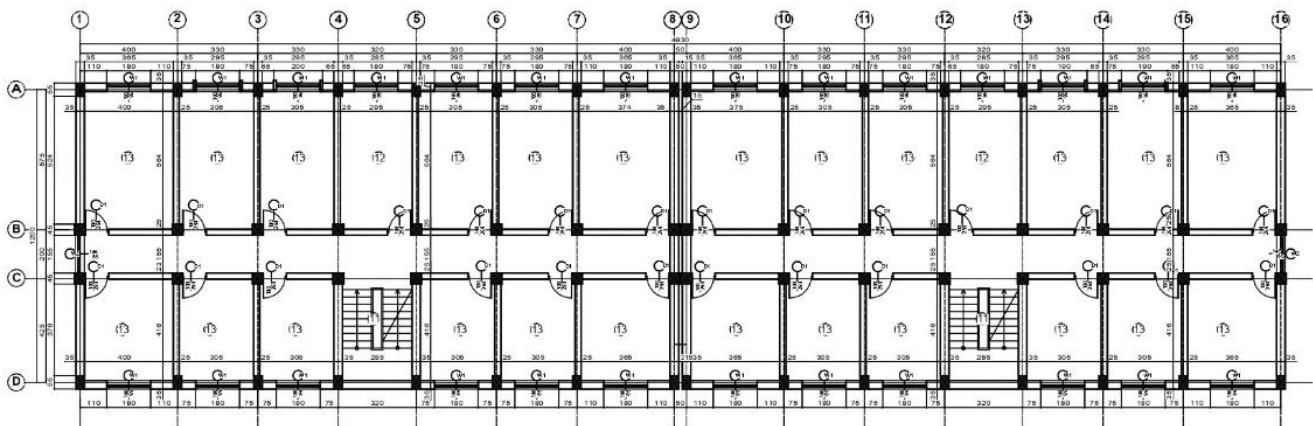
Floor plan of the modeled six-story residential building in Kabul (compiled by the author).
